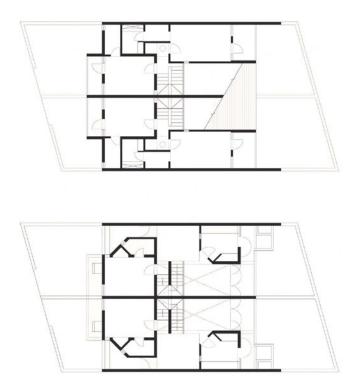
Ground and first floor plan of Shyamal row houses
